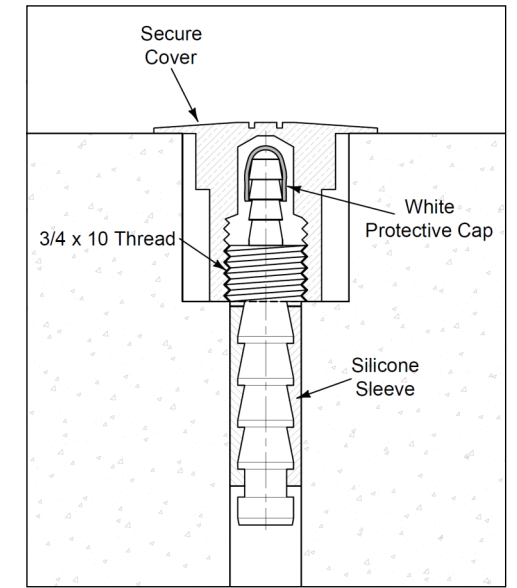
TYPICAL FLOOR PENETRATION AND RISER DETAIL
